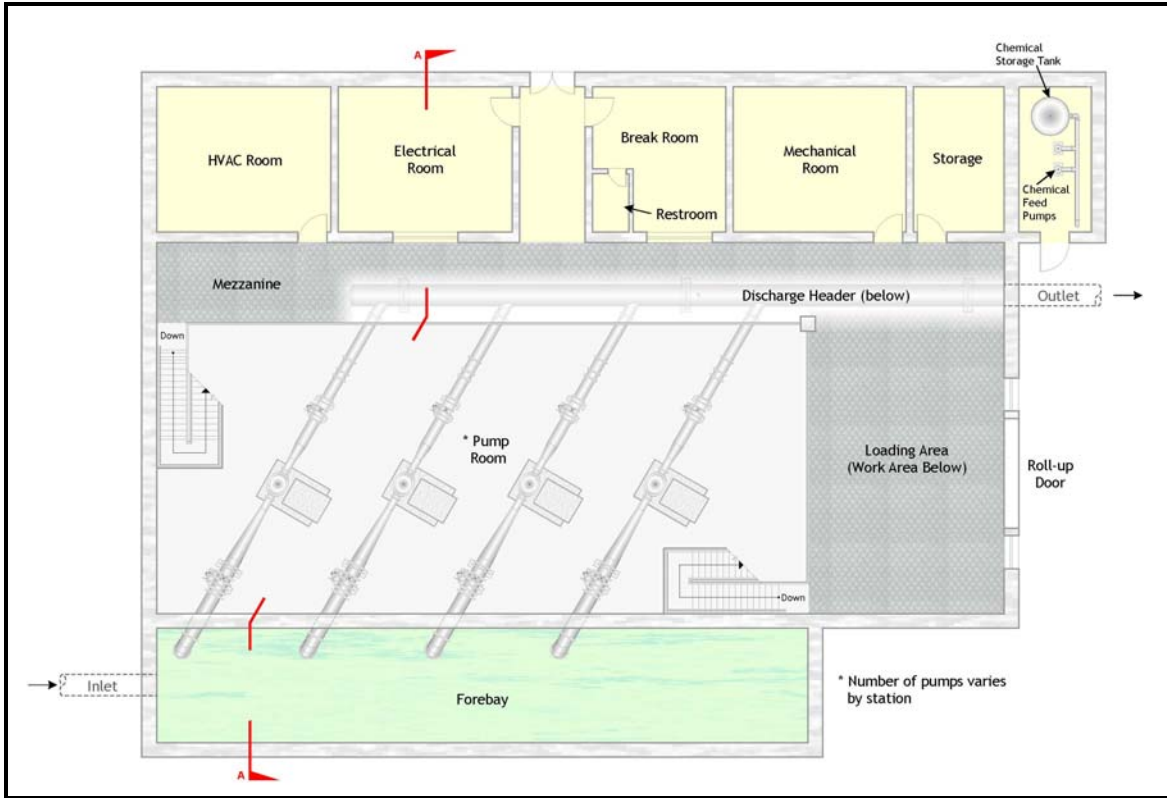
Pumping Station Layout, Preliminary Floor Plan
